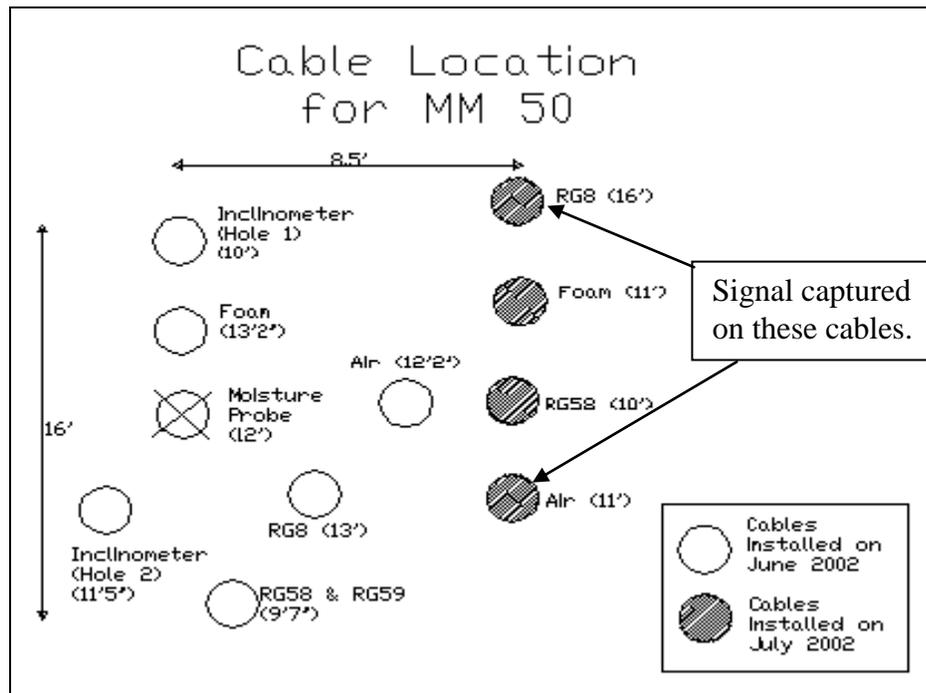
Cables and inclinometer casings installation layout on MM50.
